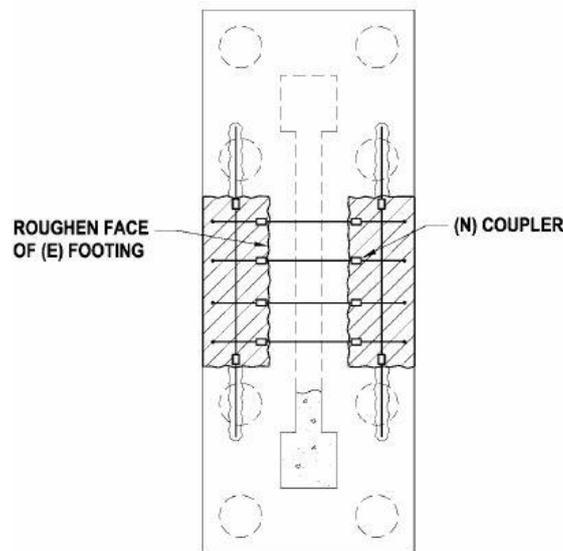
New mat foundation between existing drilled piers (plan) [1].
